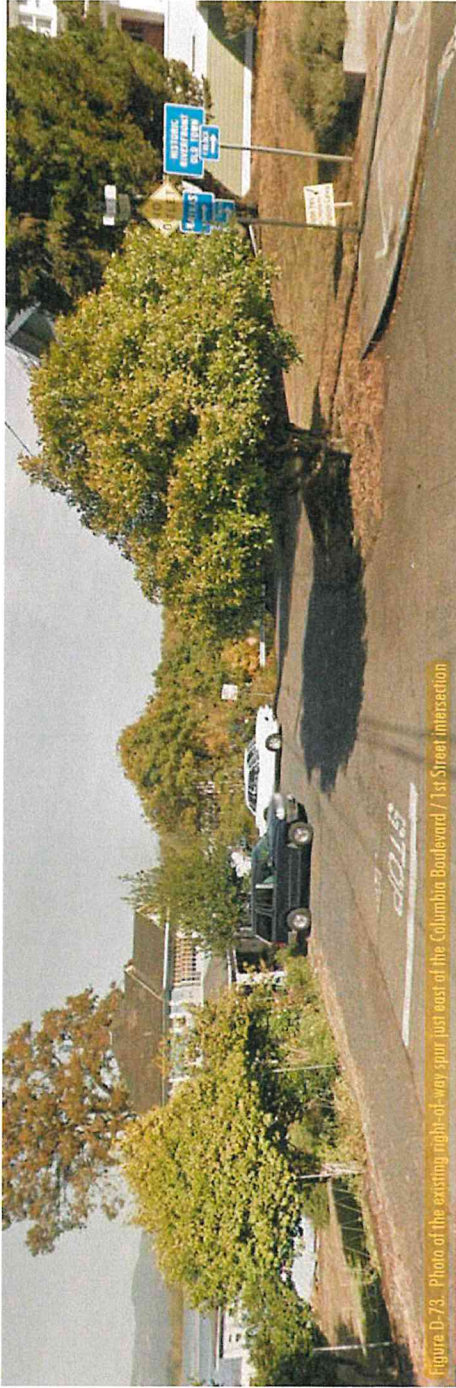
Photo of the existing right-of-way spur just east of the Columbia Boulevard / 1st Street intersection
